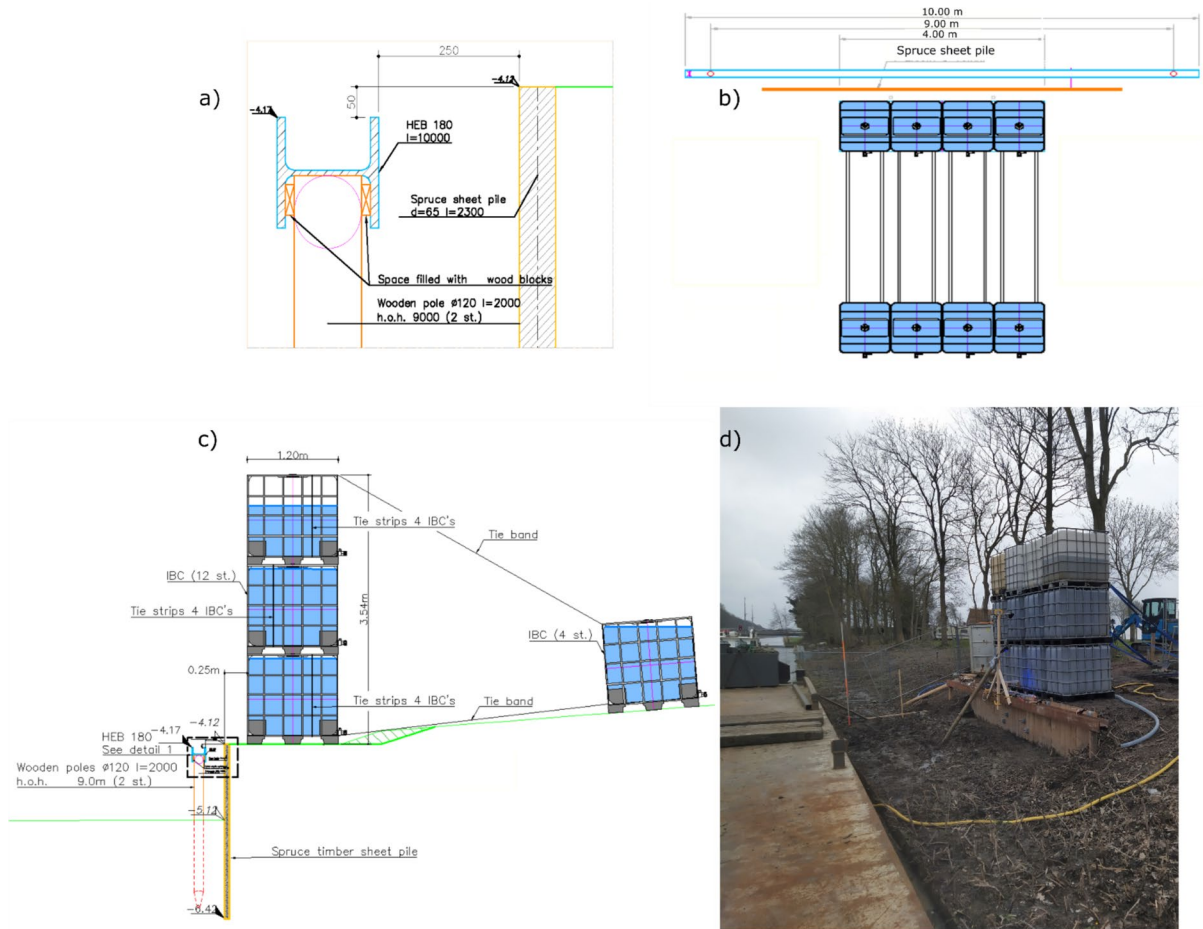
Loading setup a Detailing in the placing of HEB 180 beam, b Plan view of the test section c Testing setup section view, d Picture from the test site during surcharge loading
